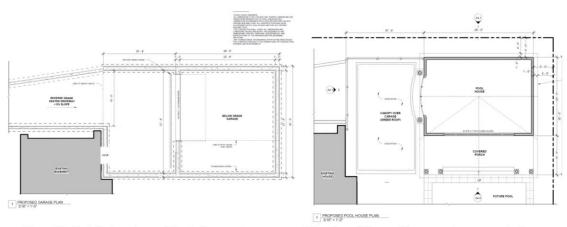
Detail plan views of the below grade garage and the plan of the pool house and green roof. Source: Design Valley 2021
